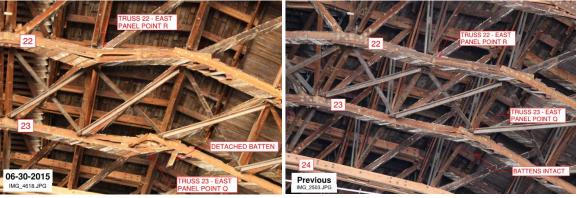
Truss damage progress at Trusses 22 and 23 East near Panel Points R and Q.
